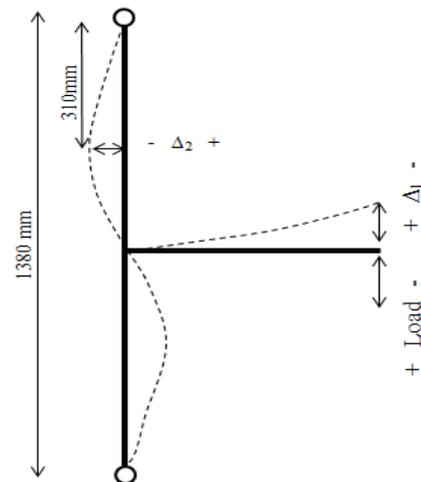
Instrumentation position details and projected distorted geometry (up loading)
